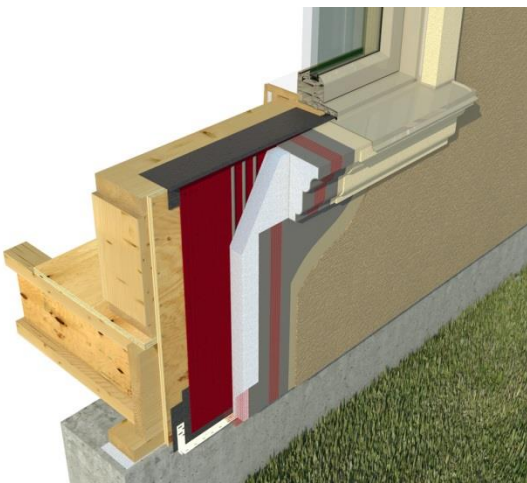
“Adex-VCA” system with a water penetration barrier over plywood/OSB
